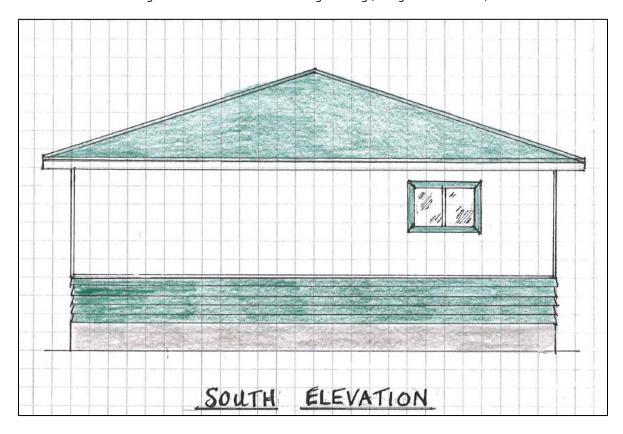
South Elevation of proposed development (facing neighbours to the South)
